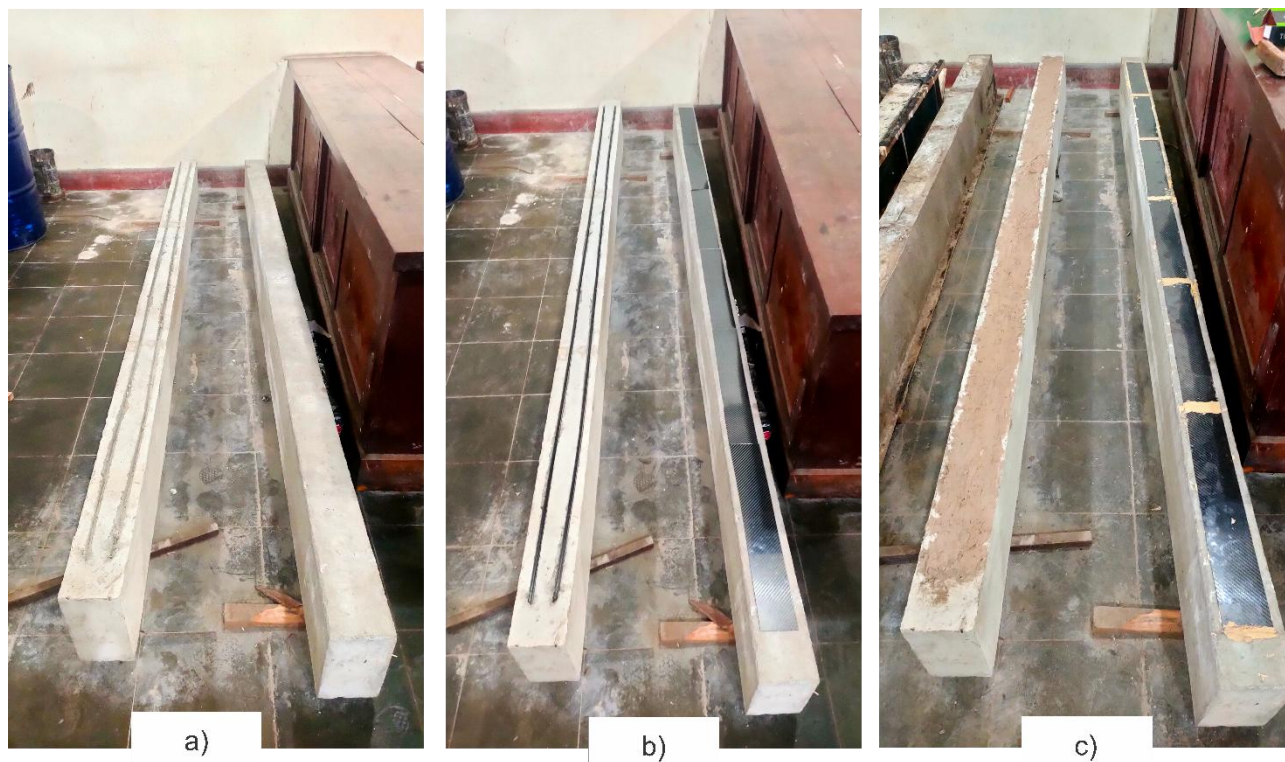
Installation of Sheet CFRP (BLC) and Rebar Rod CFRP (BTC) with a) before installation, b) installation sheet and Rebar CFRP c) glue with epoxy adhesive
